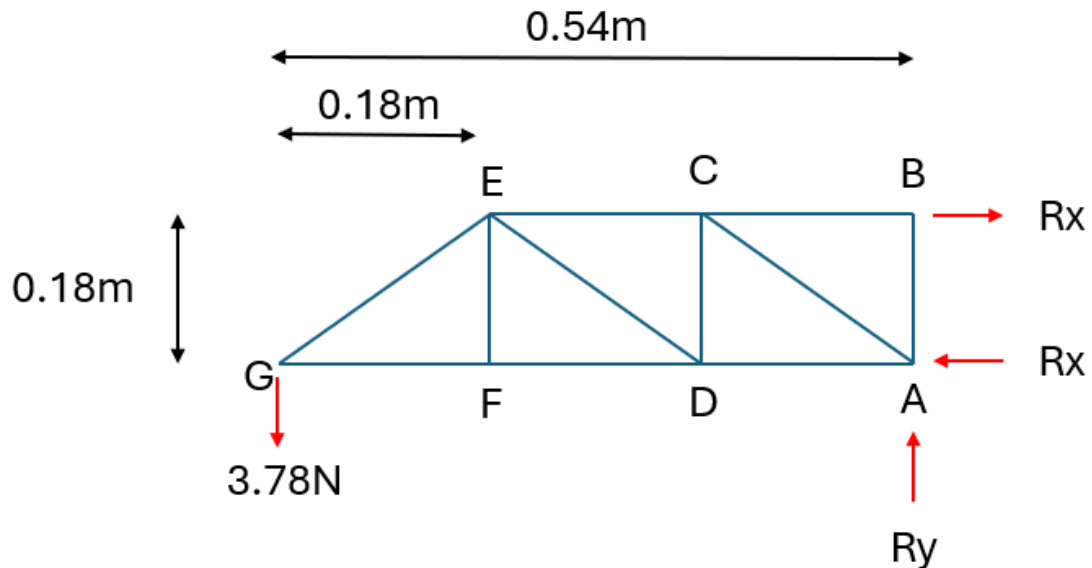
Diagram Warren Truss Cantilever Bridge Five Cell
